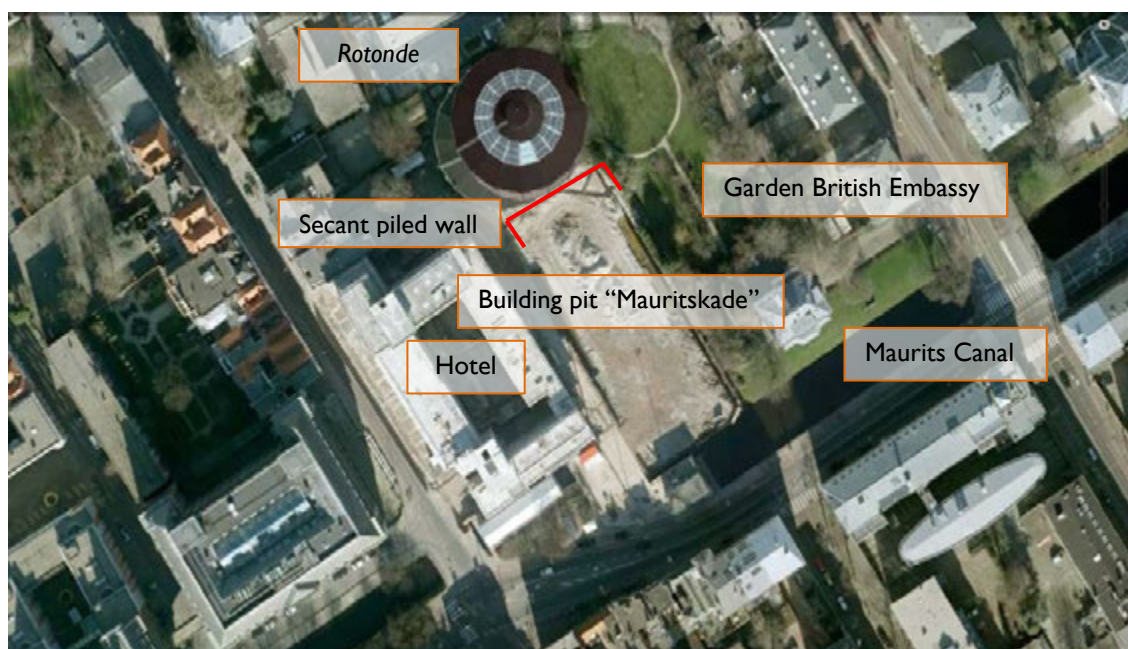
Overview of location Museum Panorama Mesdag and the building pit (source: Google Earth)
